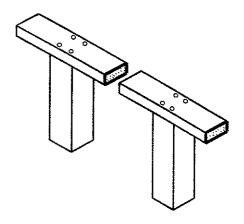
Exterior Connection: Top Rail Nailed to Post
